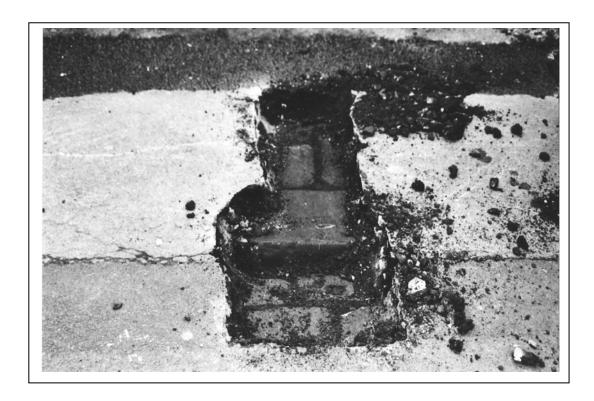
Lamp-post 3 - stone setts and kerb beneath modern pavement
